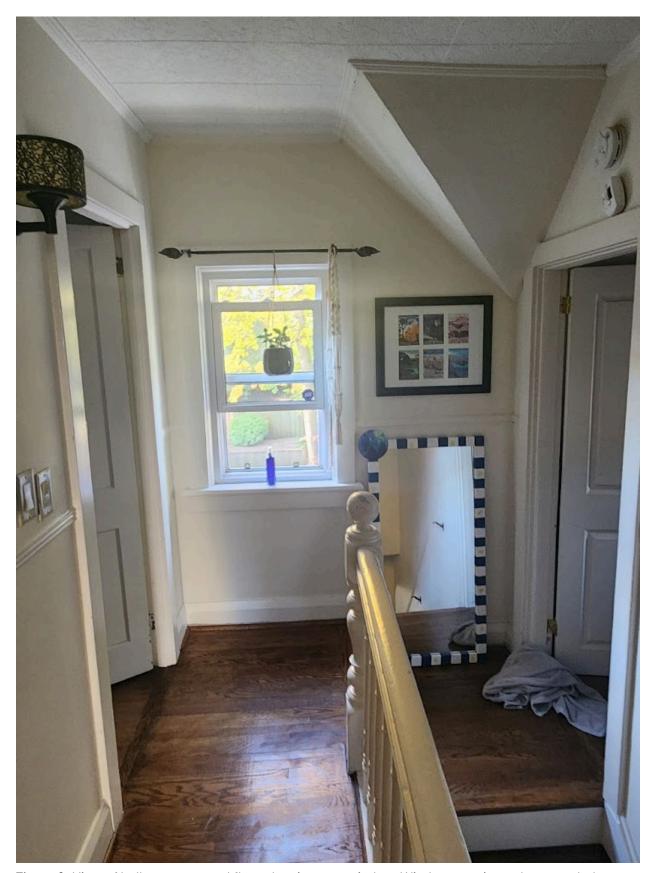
View of hallway at second floor showing rear window. Window opening to be extended to floor to accommodate access to new primary bedroom. (Photo by owner, October 2024)
